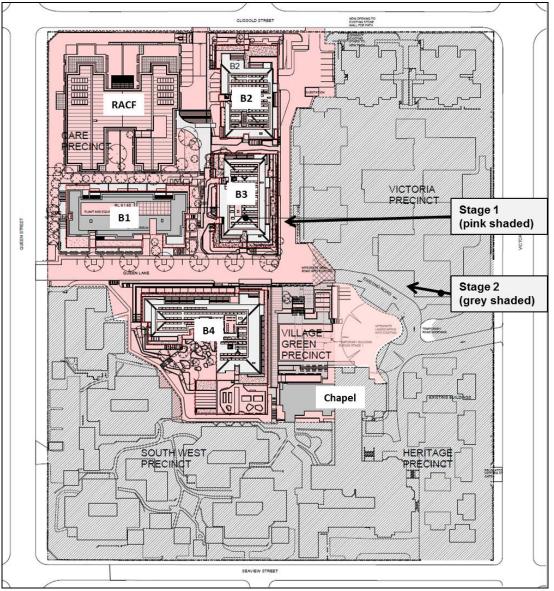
Proposed staging plan (Base image source: proponent's RtS)
